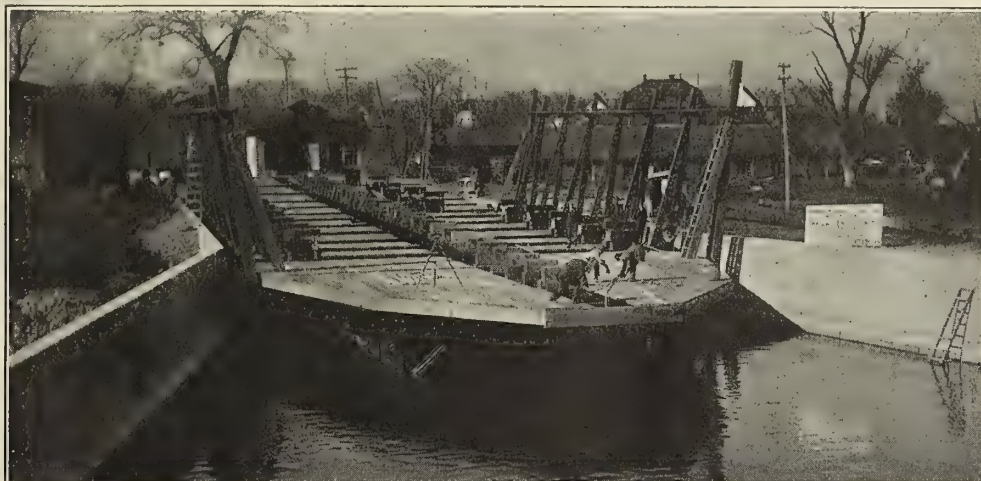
Crandall Railway Drydock at Selkirk, Manitoba
